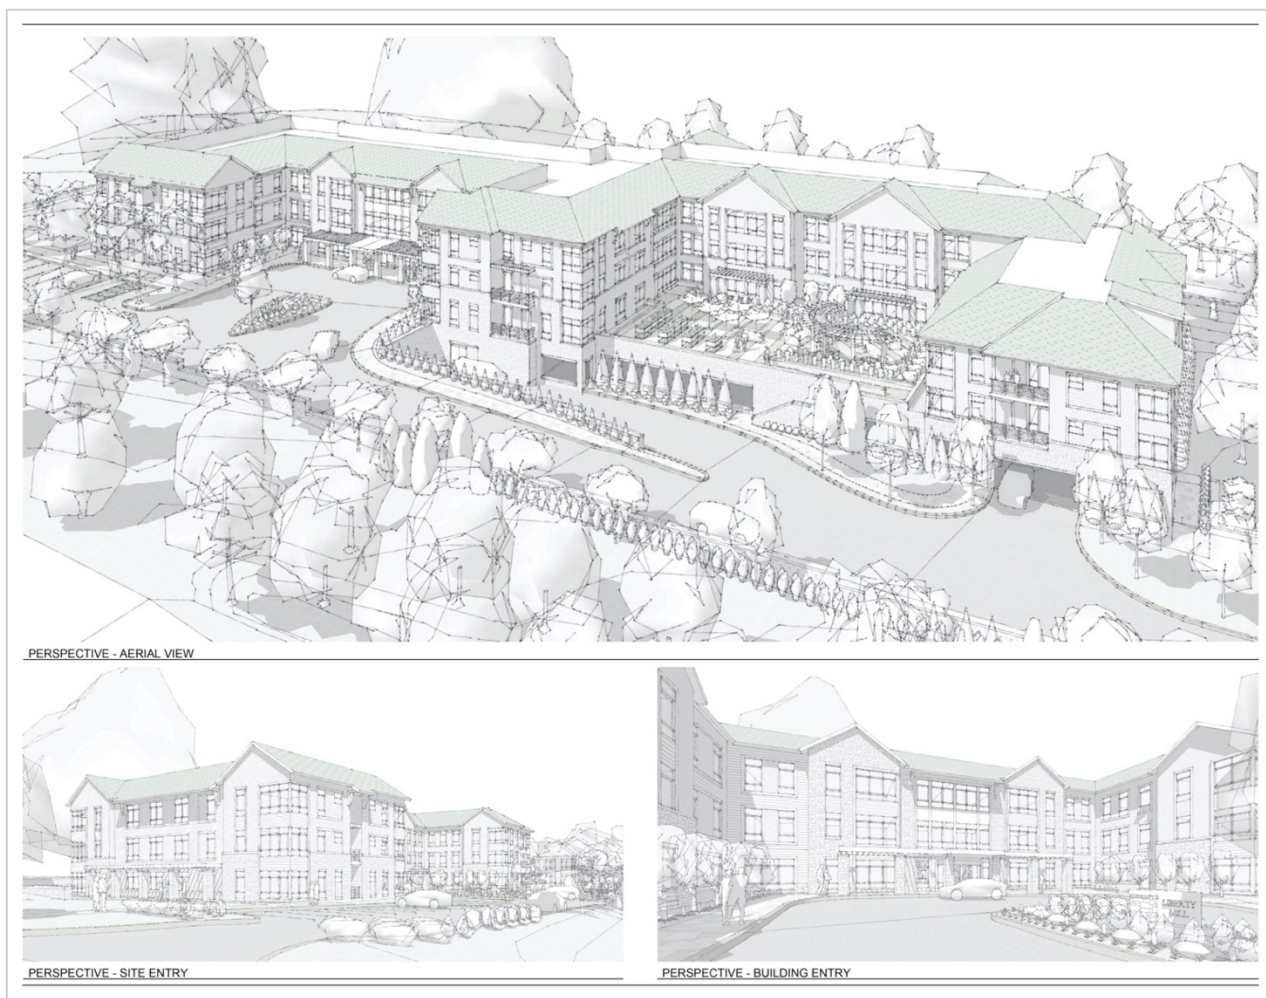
Perspective elevations. Top: south elevation, Bottom Left: property entrance west elevation, Bottom Right: building entry and passenger loading area on south elevation.
